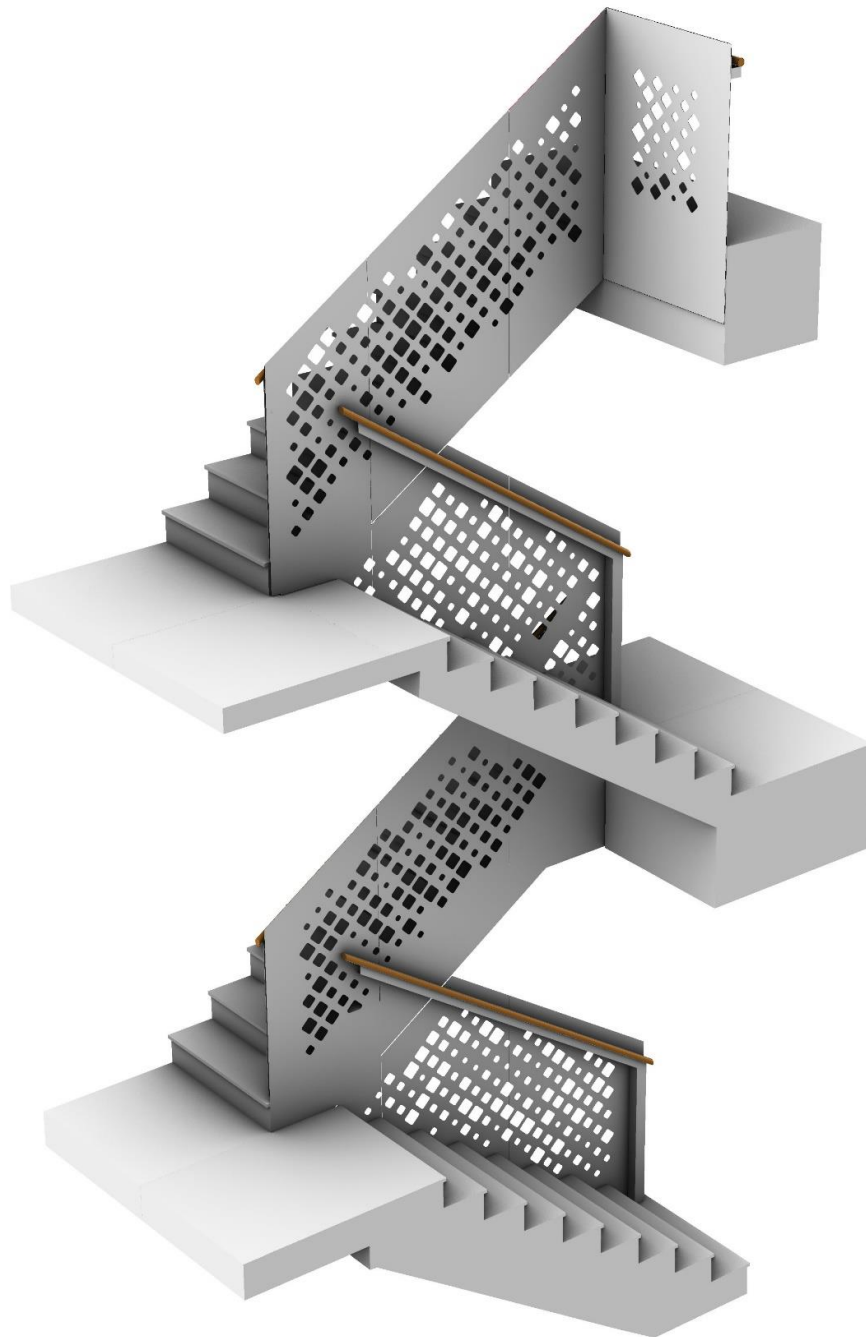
· Study of stair railing with openwork of different sizes in steel sheet. Author's project
